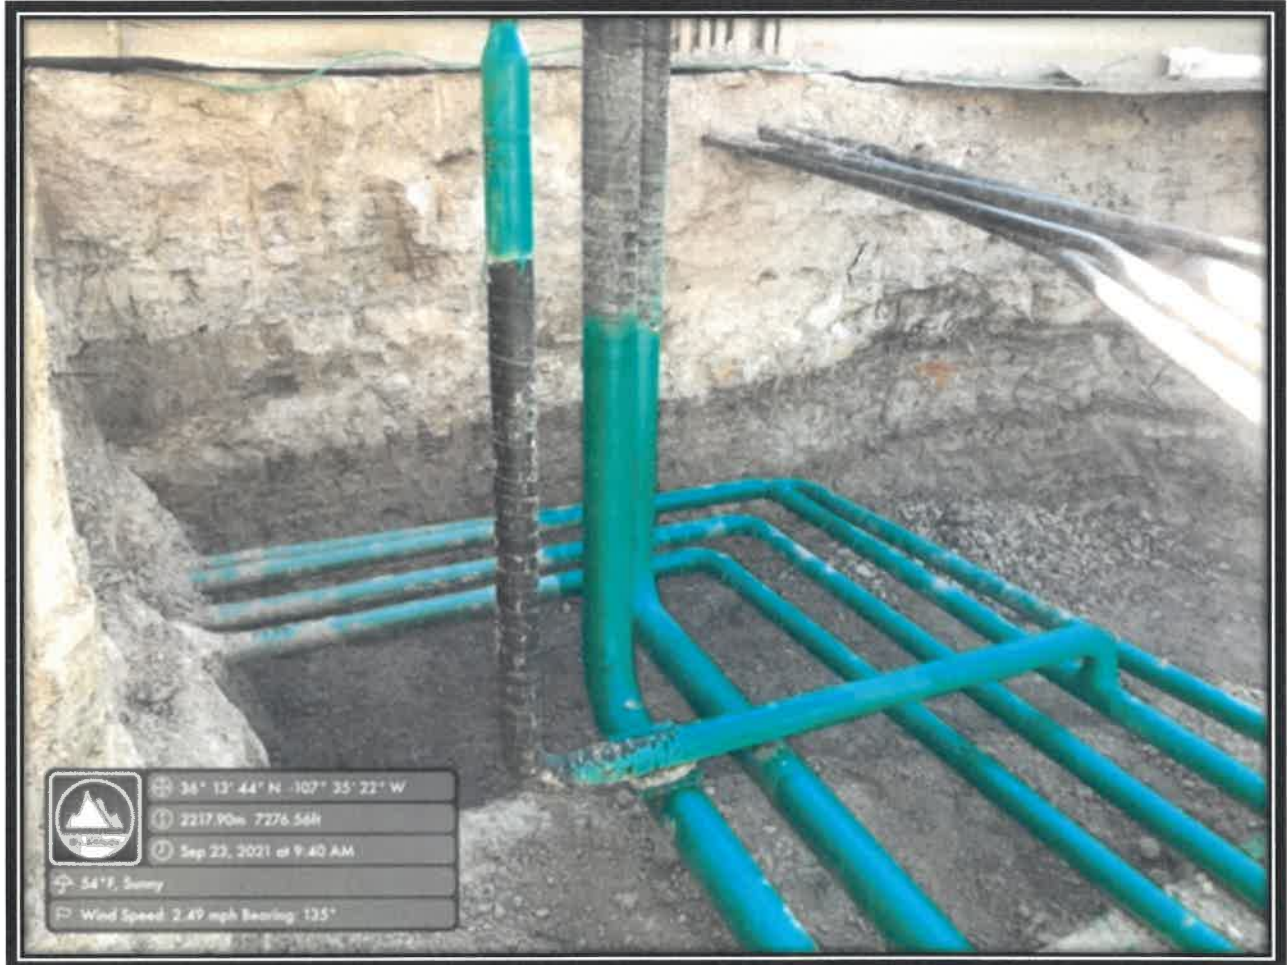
Sampling Event 9/23/2021 North Wall/NW Bottom
